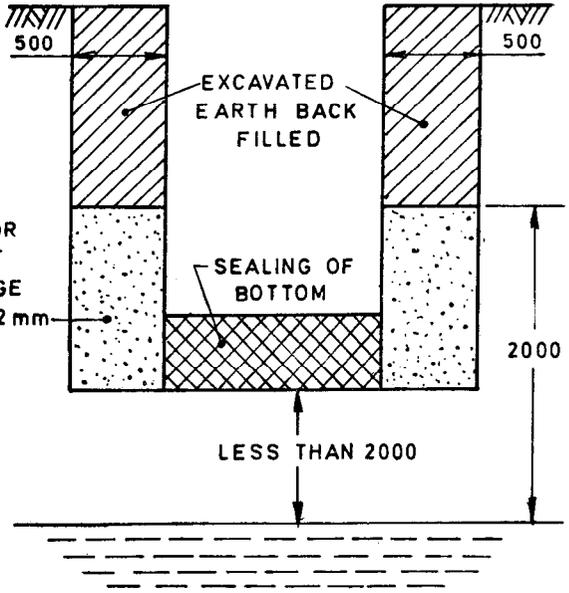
TYPICAL SKETCH OF LEACHING PITS
